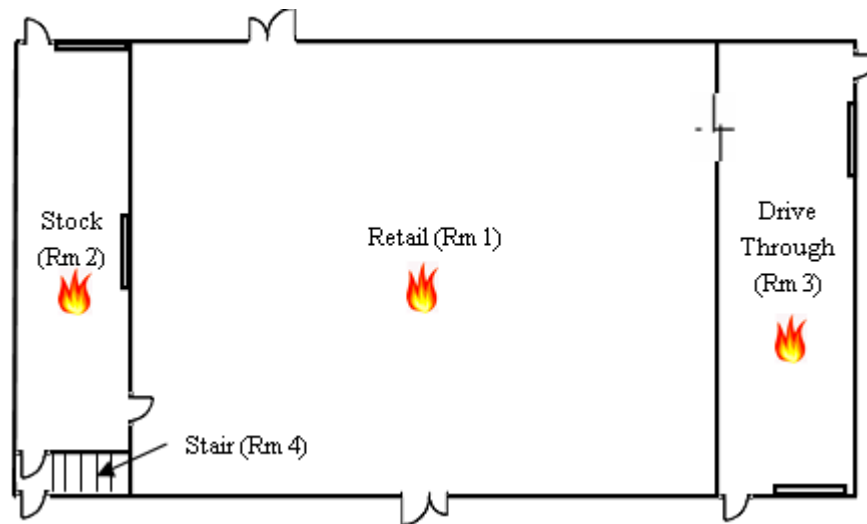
Geometry as modeled in BRANZFIRE – Warehouse ground floor
